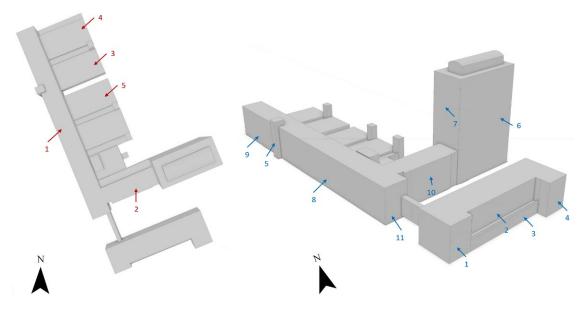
(left): Bouwcampus: roof segment IDs Figure 40 (right): Bouwcampus: facade segment IDs
